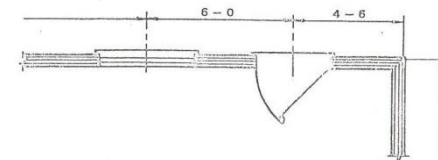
Windows and doors should be located using a center line, type of window indicated, and door swing shown.
